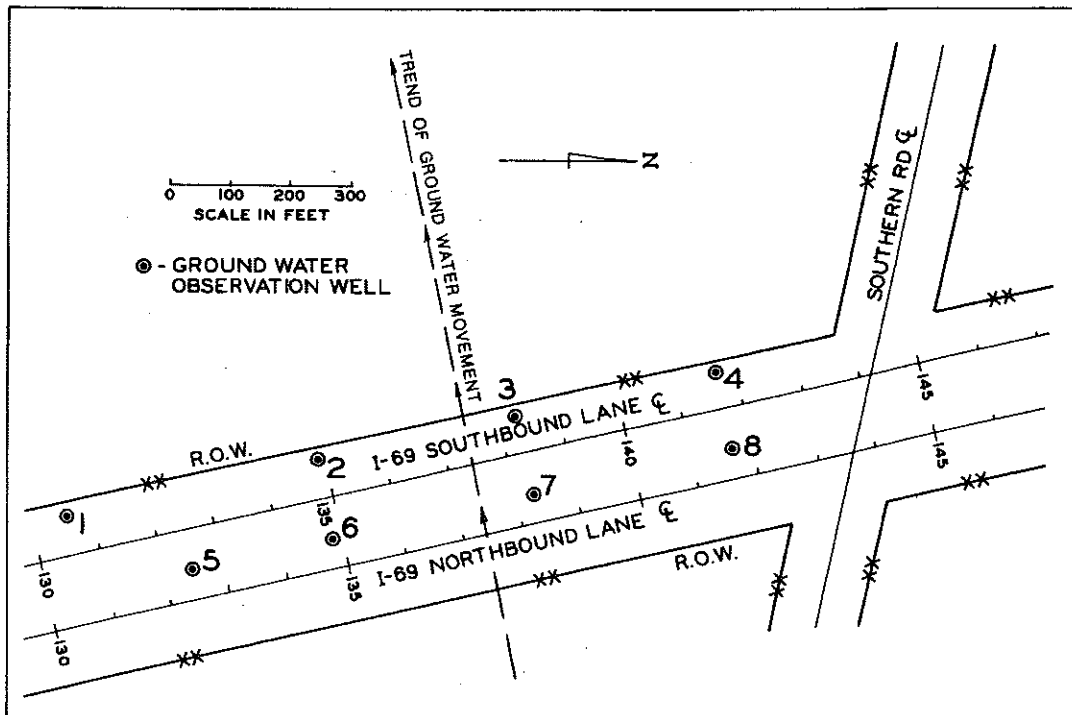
I 69 well locations: I 69, Southern Rd area (Sections 10 and 15, T8S-R6W, Kinderhook Twp, Branch Co.). Roadway opened to traffic in 1967.
